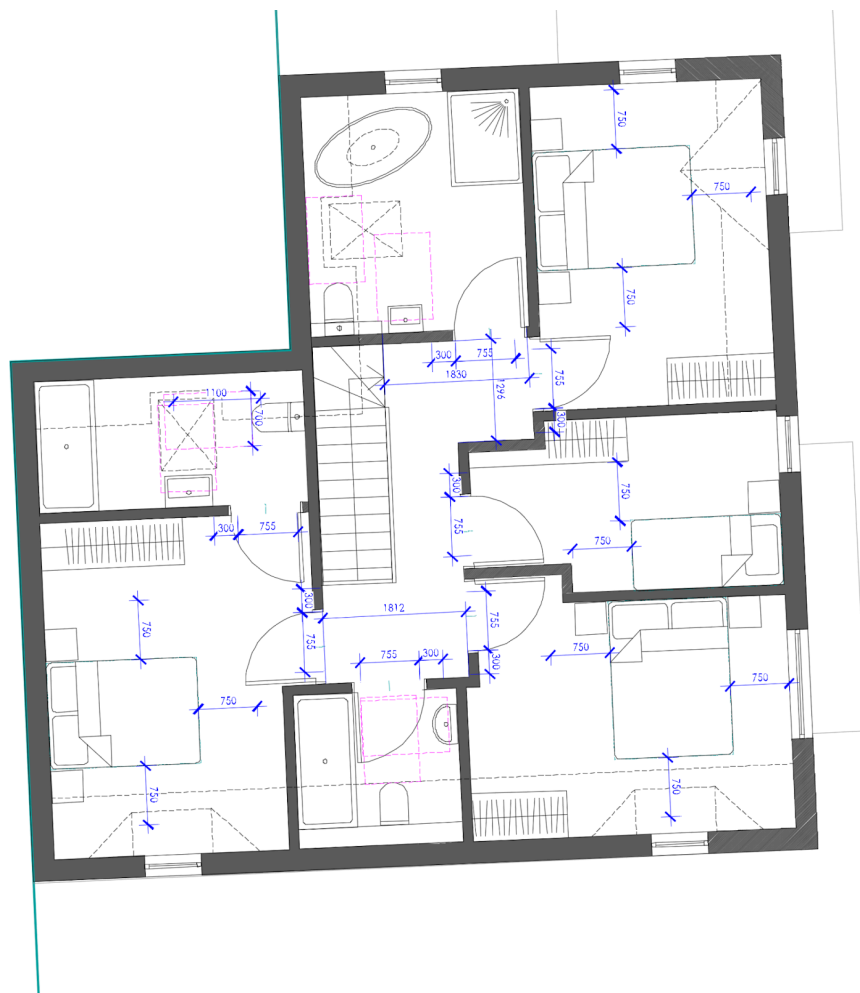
Plot 7 proposed first-floor circulation space, 1812 mm wide. Proposed plans of all bedrooms with dimensions showing minimum clear space around the bed. Extract from drawing 2041.03.03.Pln01.023.
